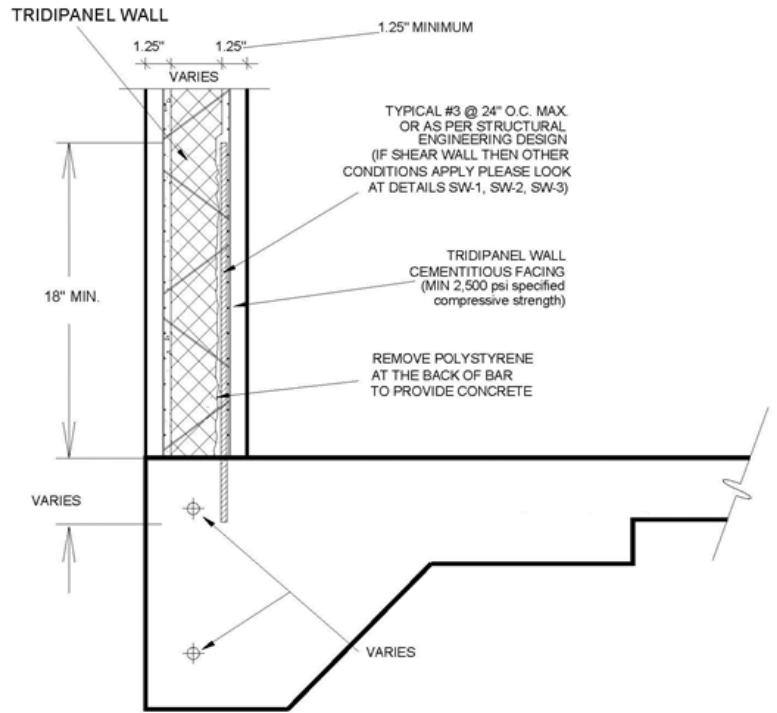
DETAIL, EDGE FOOTING/WALL CONNECTION (PERIMETER WALLS)
